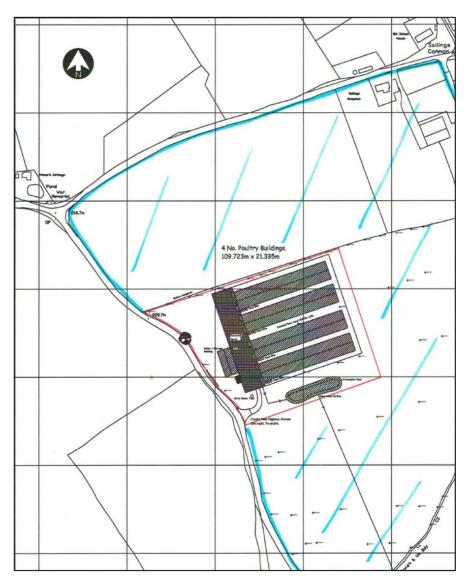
Site location plan (with proposed site of poultry unit denoted in red)
